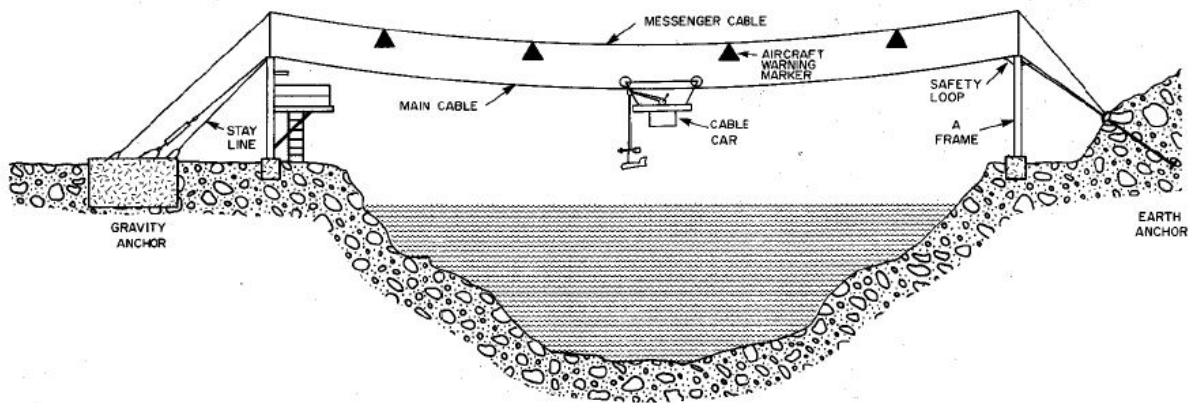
Schematic drawing of a cableway with a concrete mass anchor and a plate anchor.
